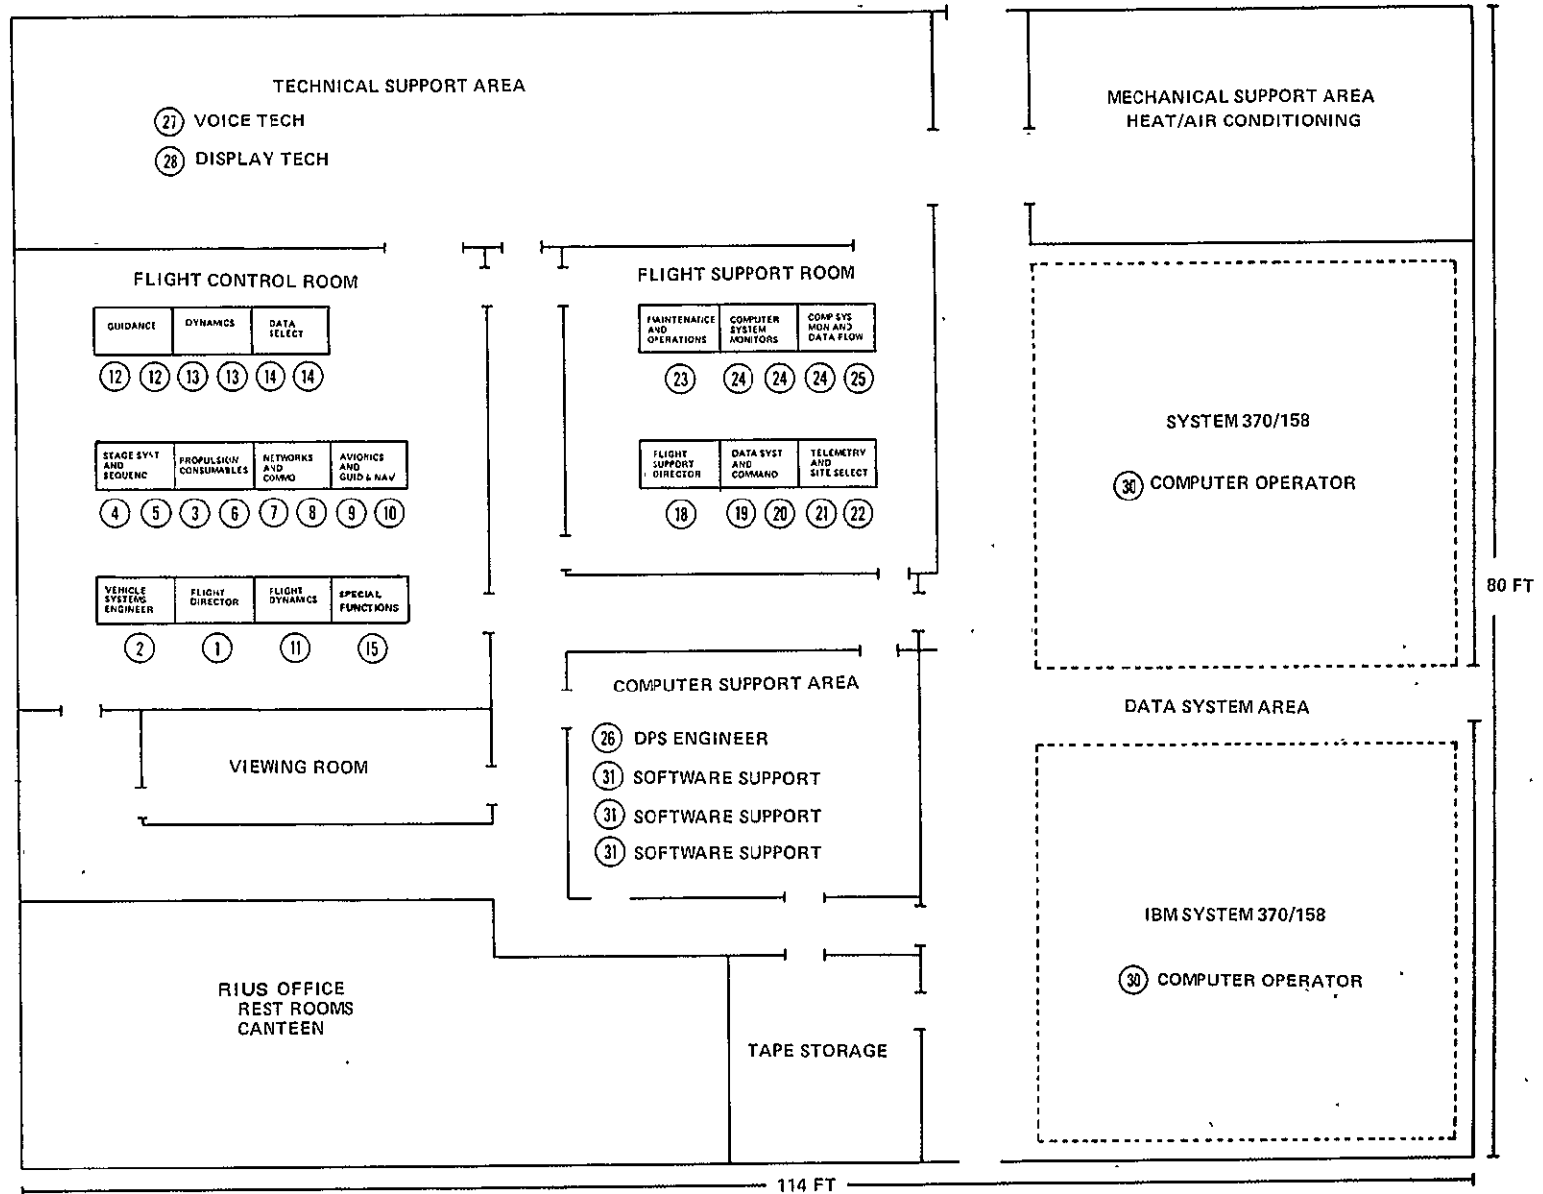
IUS/OC Representative Floor Plan and Support Staff Stations
